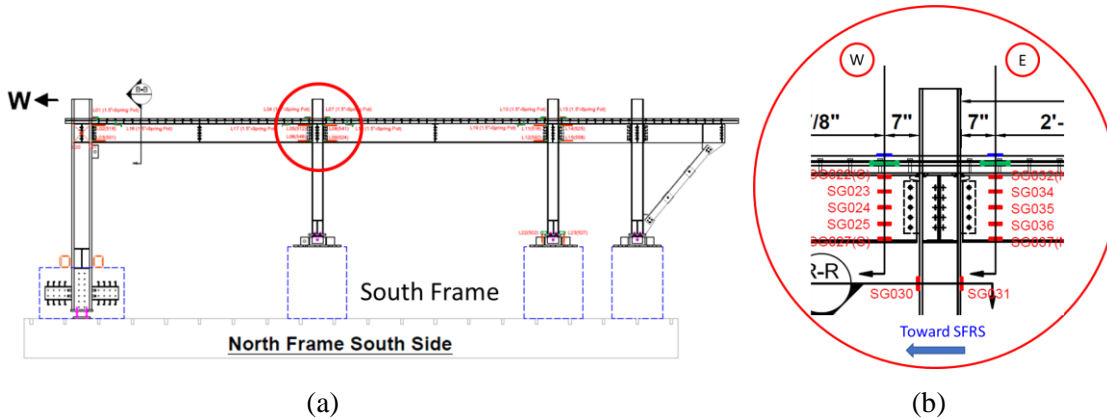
Shake Table Test Instrumentation: (a) First Level; (b) Typical Connection Strain Gage Layout.
